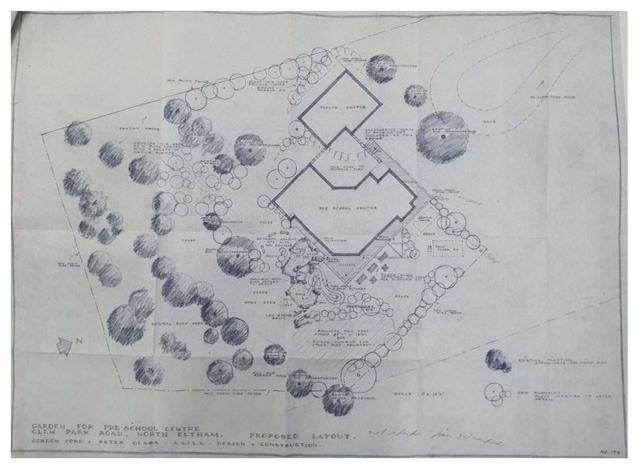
Plan for the proposed layout by landscape designer Gordon Ford and artist, conservationist and landscape architect Peter Glass for the garden at Eltham North Preschool and Infant Welfare Centre, c1973 (PROV c1973, Public Building File).
